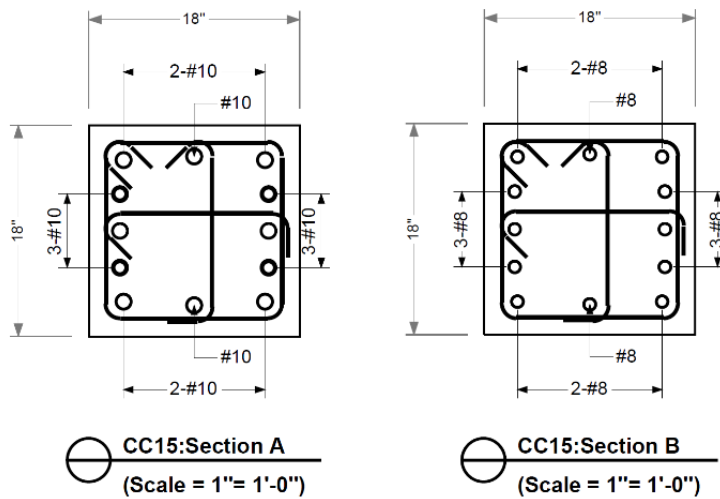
Column 33 & 34 (Rebar Diagram: Section)
